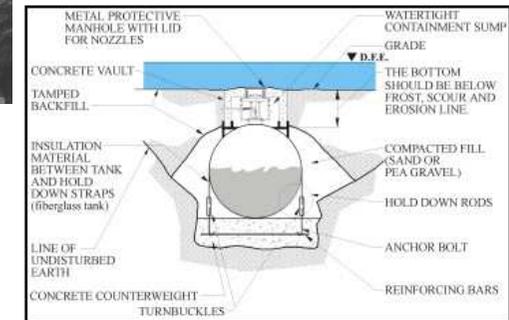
C: An underground fuel tank anchored to a concrete counterweight
